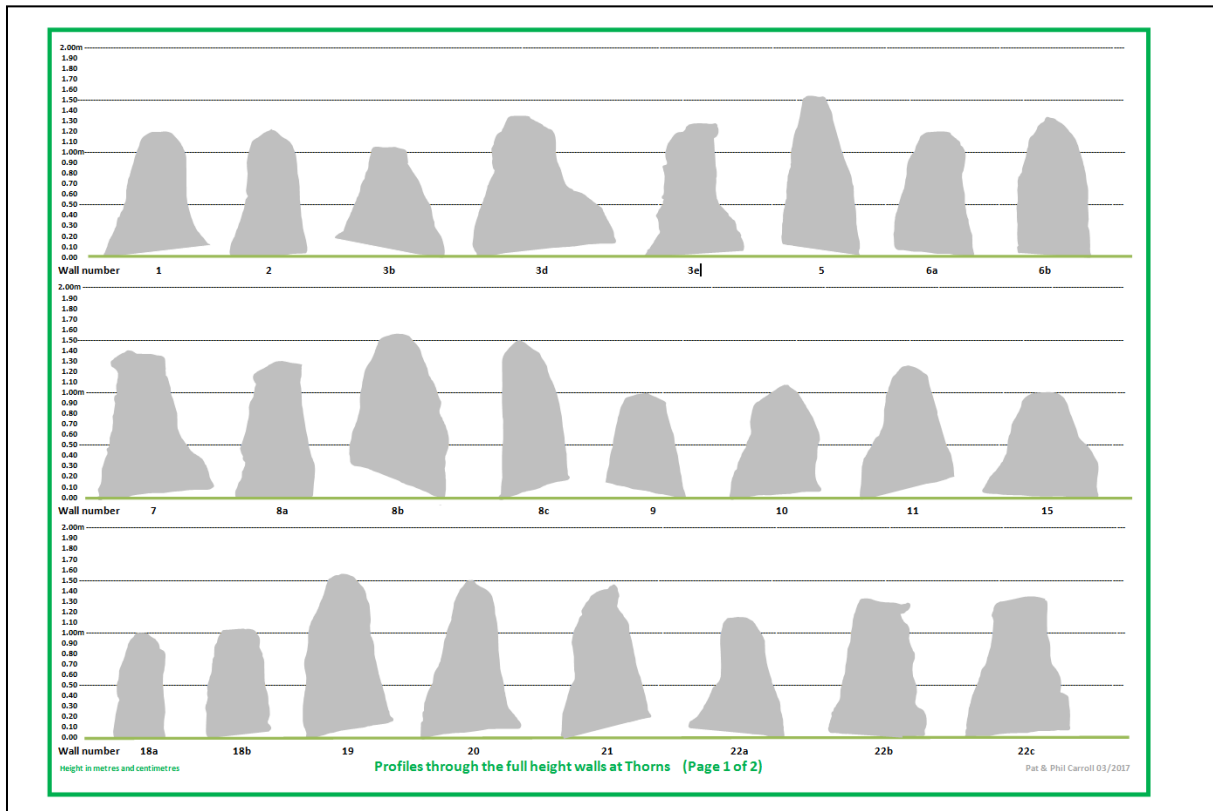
Cross-profiles for Wall nos.1 - 22c
